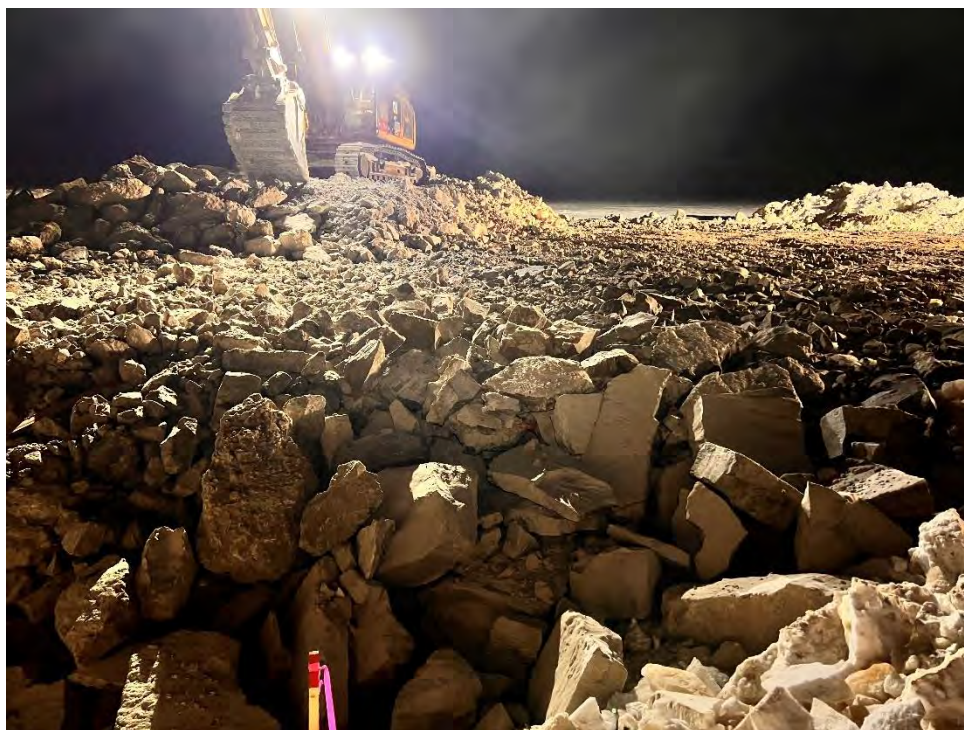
CV-057 looking west at the blasting excavation in the area of the culvert inlet (February 23, 2024)
